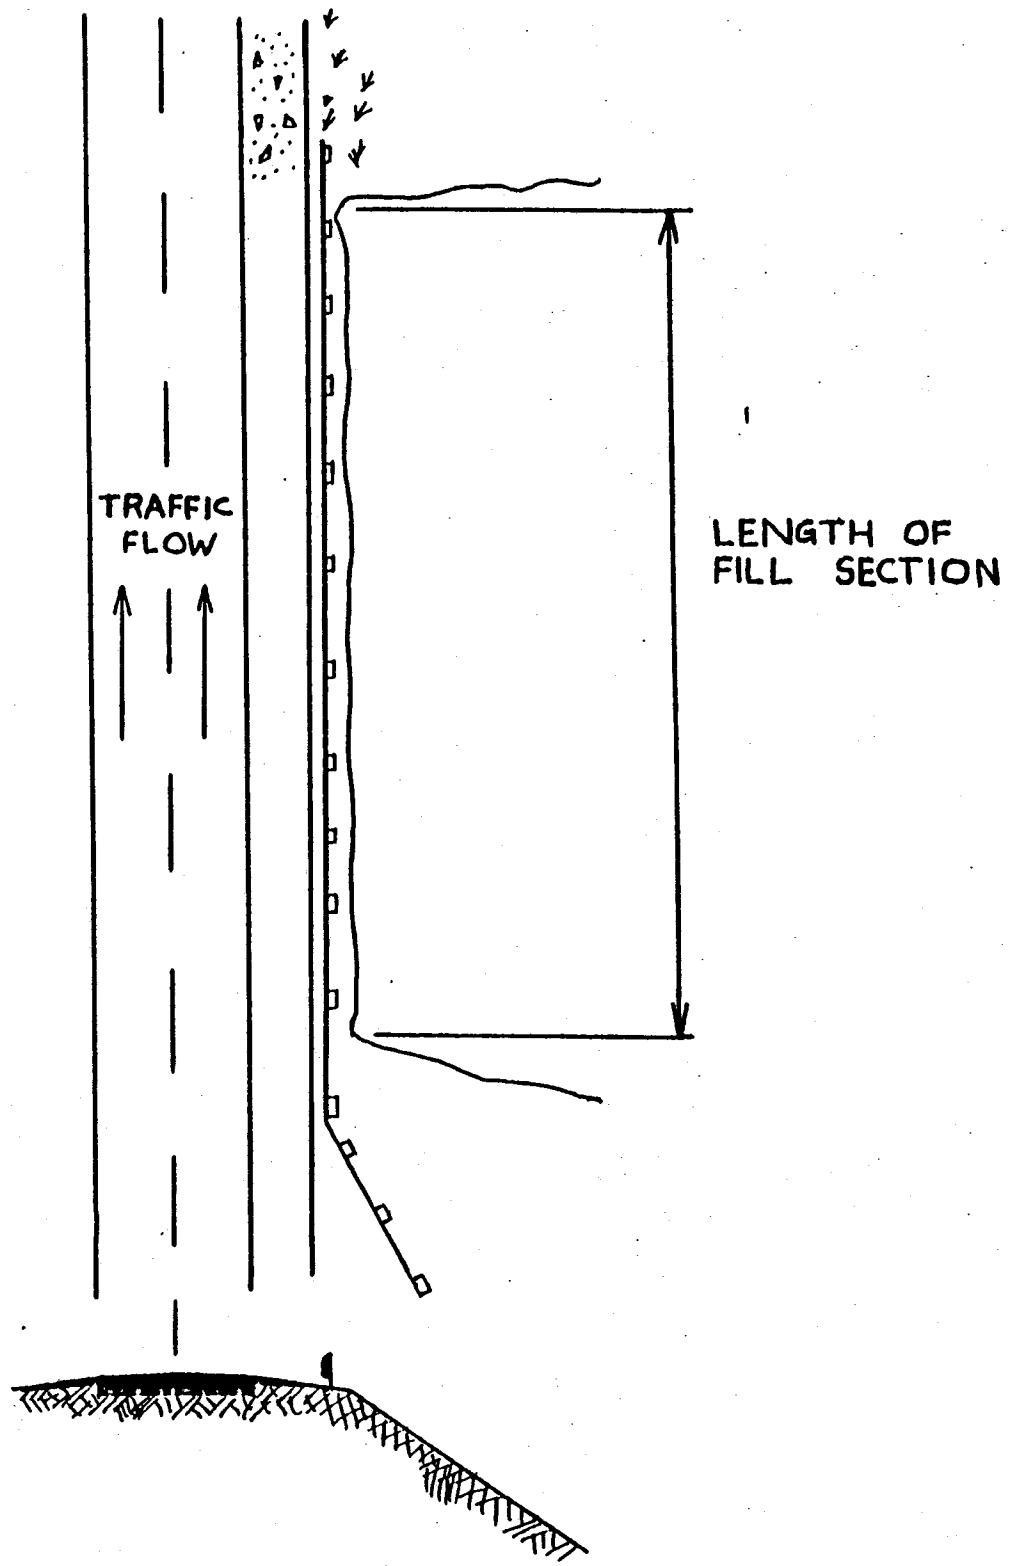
TYPICAL GUARDRAIL PLACEMENT ON FILL SECTION
